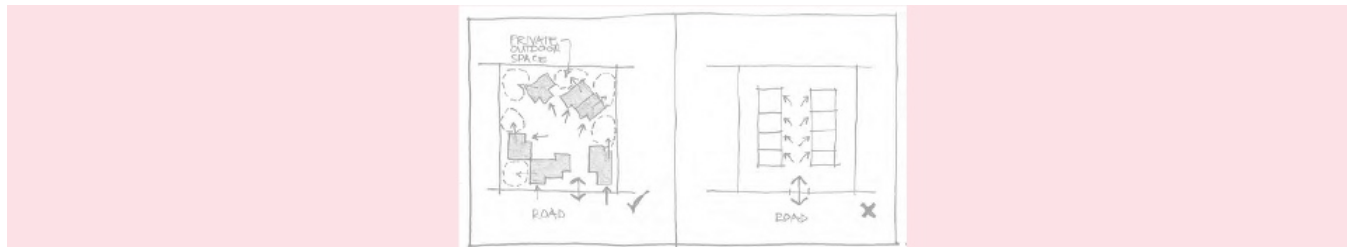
Carefully considered layout of buildings on sites helps to contribute to a more pleasant living environment.
